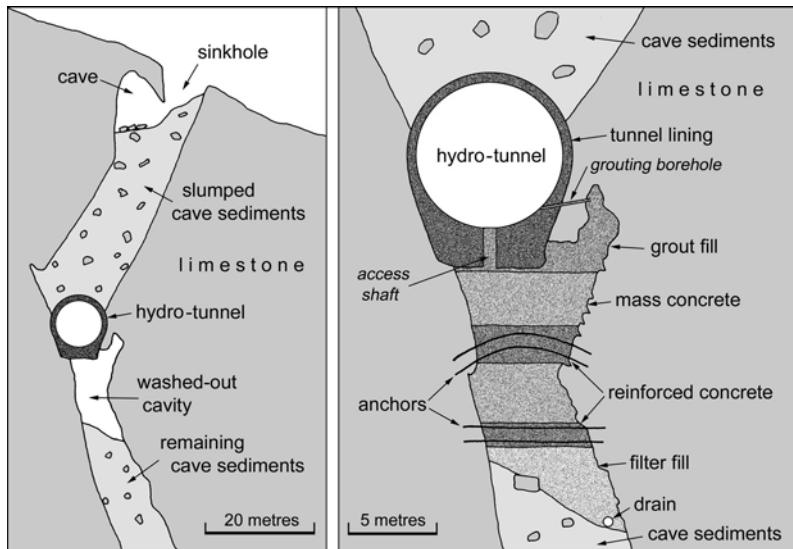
Sections through the Capljina hydro-tunnel where it passes through a filled cave in the limestone of Bosnia Herzegovina, with a detail on the right showing remedial works that were required.
